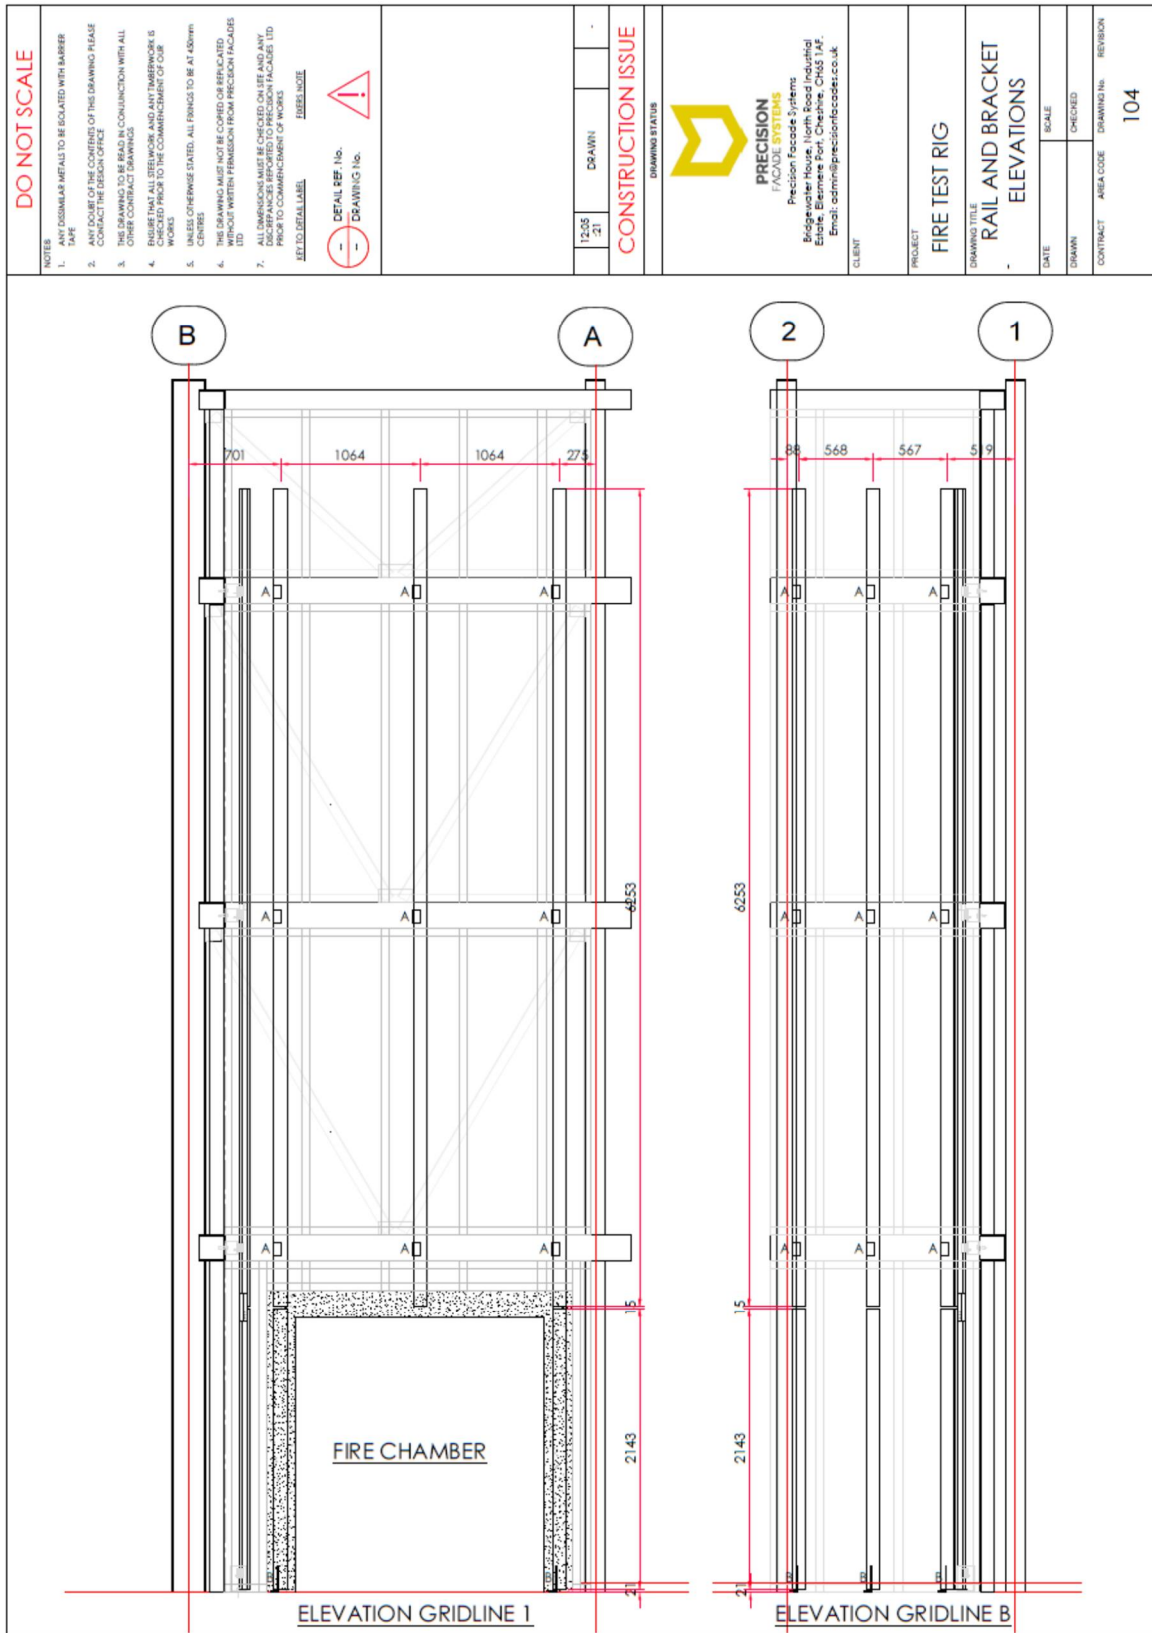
Rail and bracket layout (supplied by Test Sponsor).
